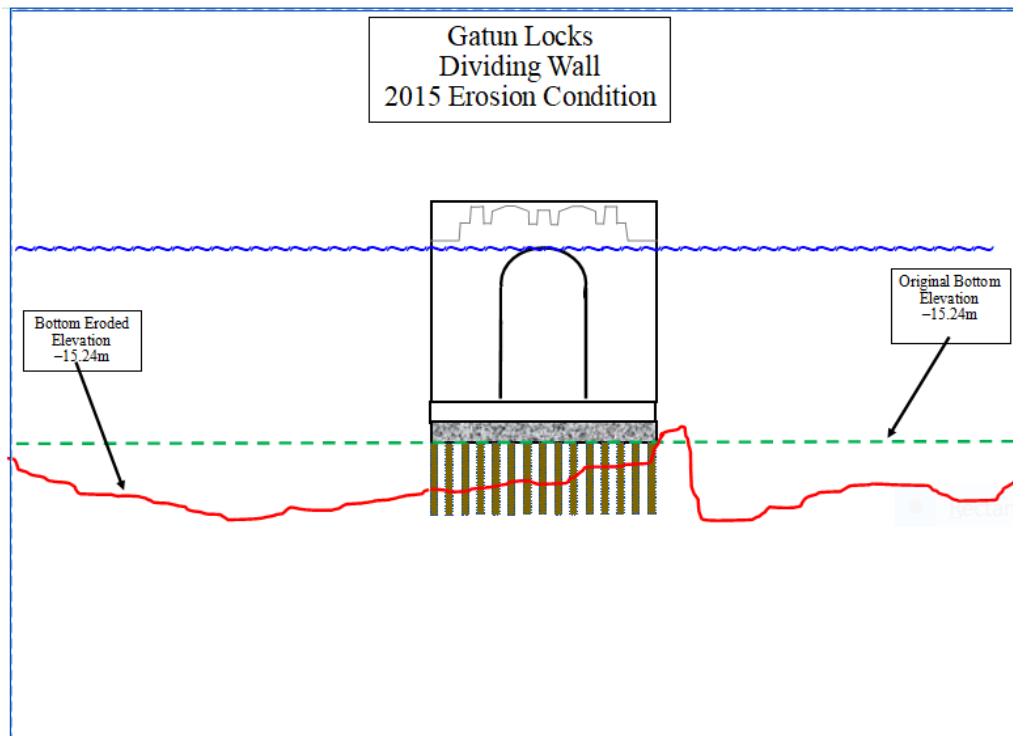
Cross Section of Gatun Locks Dividing Wall Before Repair
